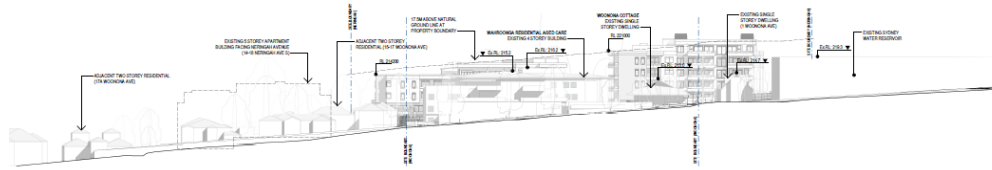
Proposed site elevation – Woonona Avenue. (Source: Bickerton Masters Architects)
